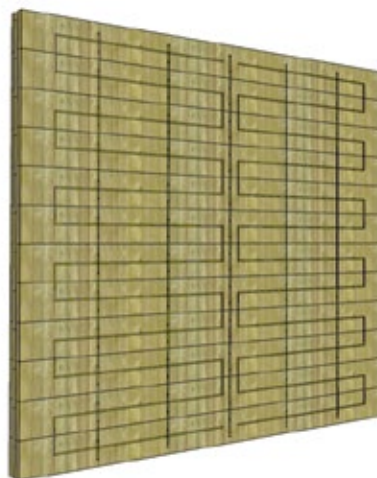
Adhesive placement between plywood and 2 × 8s in nail laminated wall.
